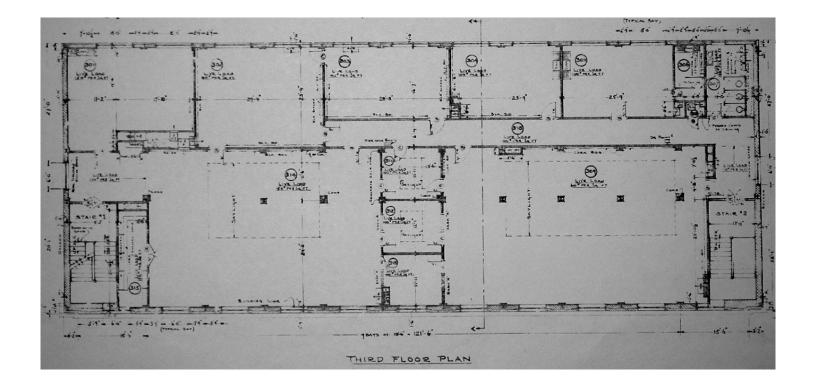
Photo of the Third Floor Plan of the Guggenheim Laboratories.
